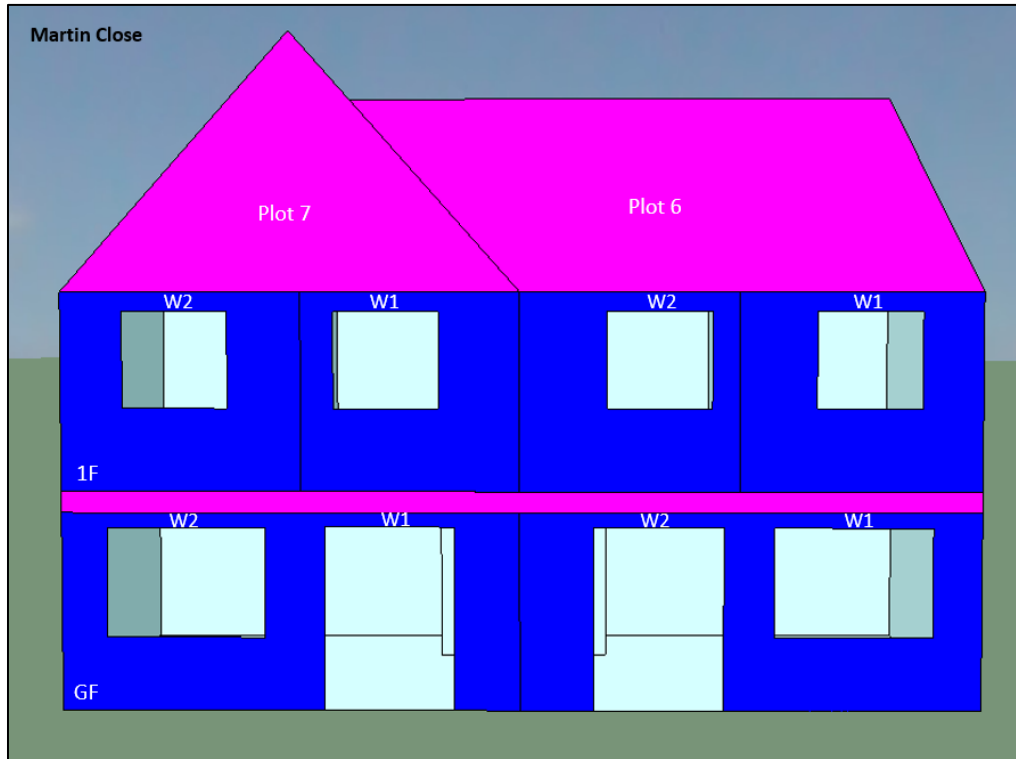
Plots 6 & 7, Martin Close (South East Elevation) Windows Tested
